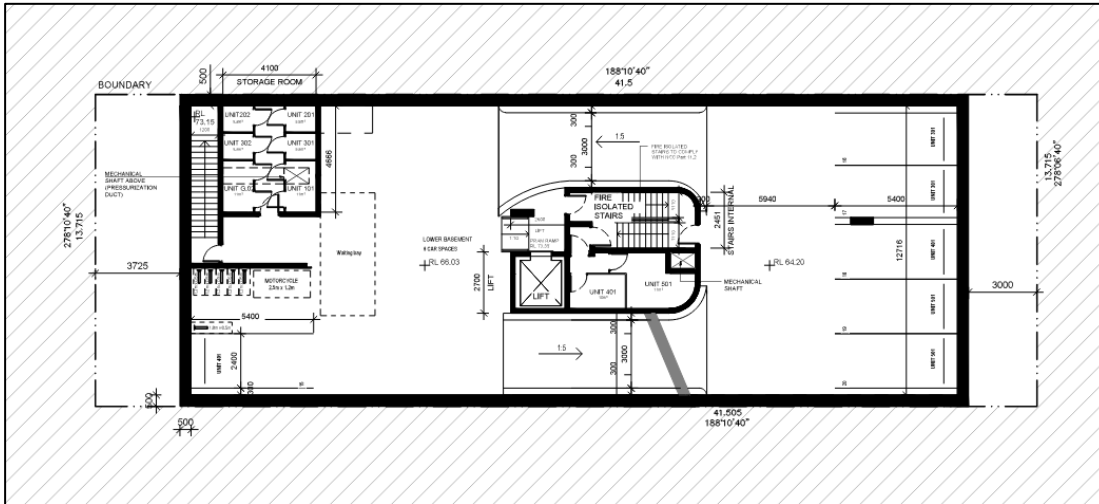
Basement Levels 6 and 5 – lowest levels (Source: Applicant)
